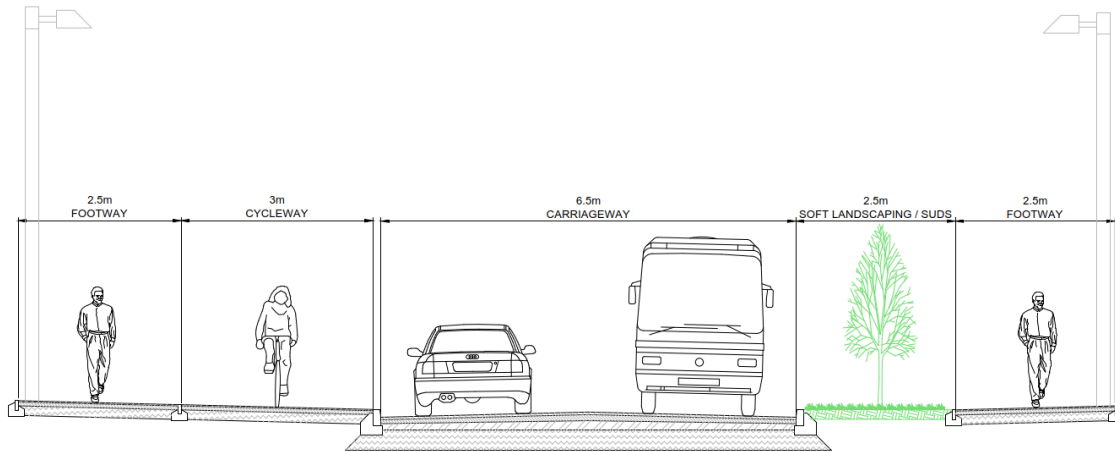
Typical cross section – Sale West and Southern link roads (WSP)
